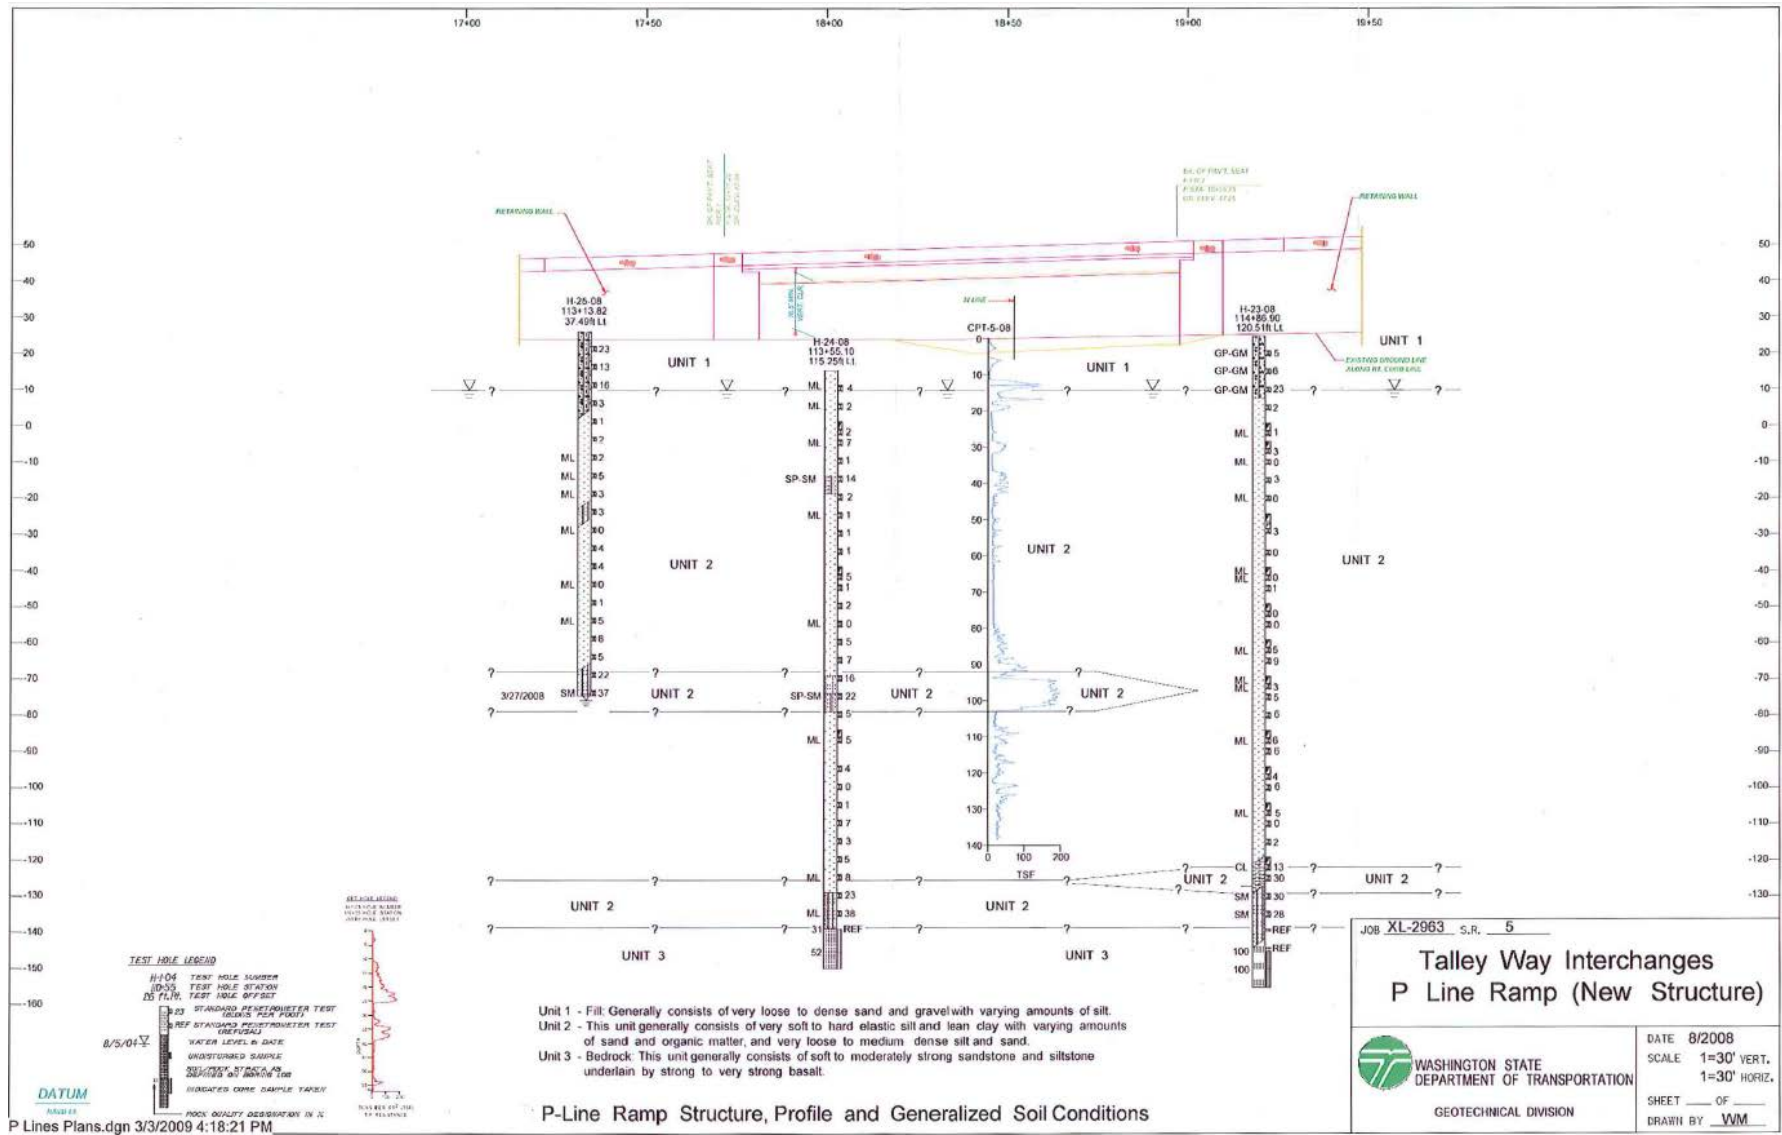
Cross-section of ramp structure, soil profile, and location of piers for Talley Way interchange.
